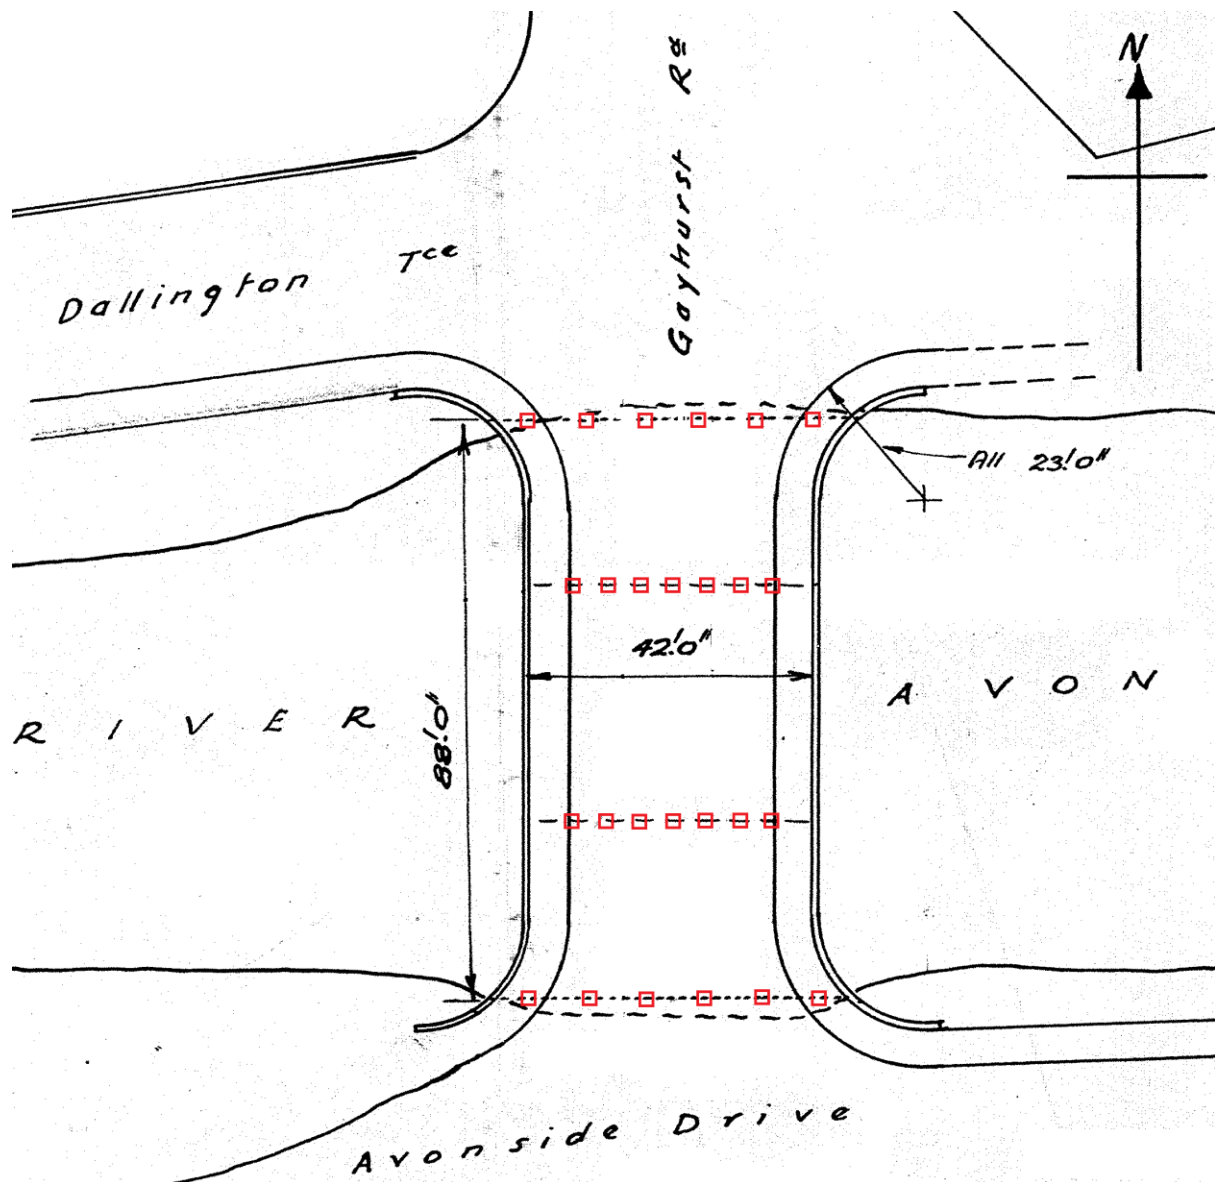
Plan view of Dallington Bridge indicating positions of piles beneath each abutment and pier, adapted from Christchurch City Council drawing
